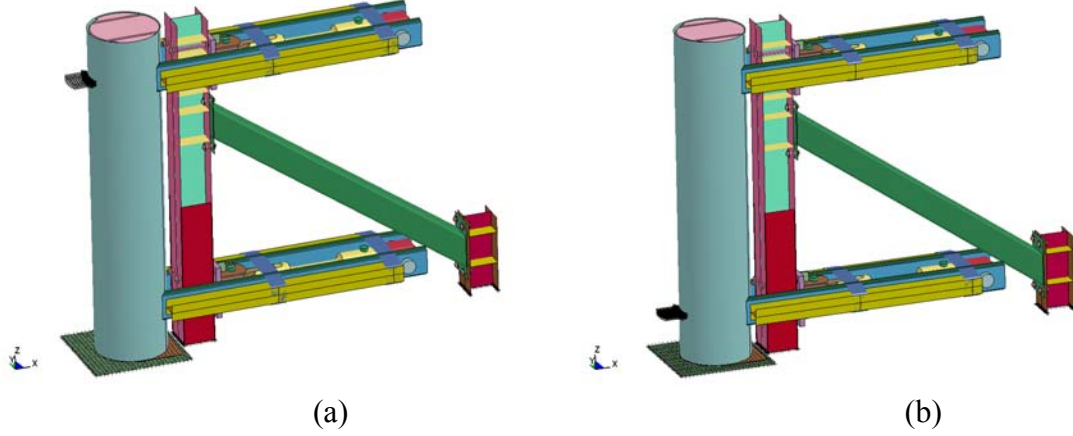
Renderings of Finite Element Model of the Pier and Structural Support System.
